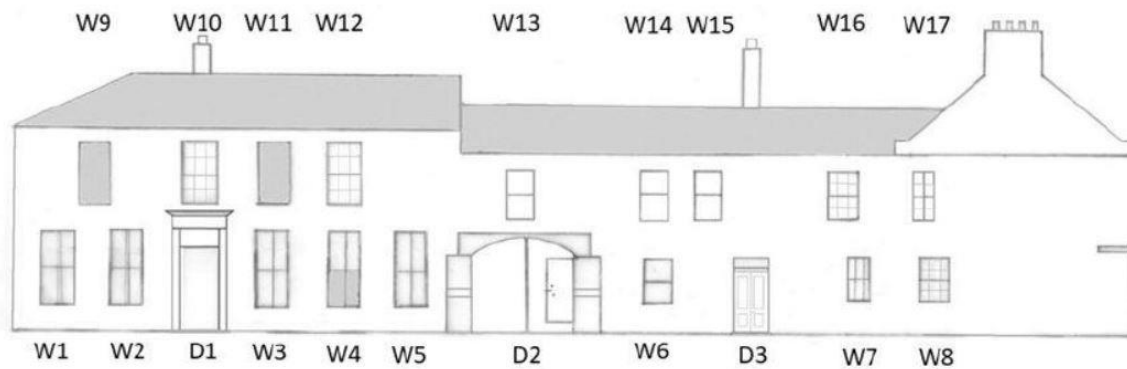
America Street Elevation (courtesy of Robert Lenfert Archaeology)
